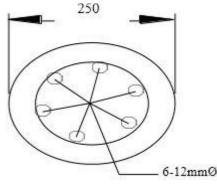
Reinforcement details in external columns 10.2InternalColumns
